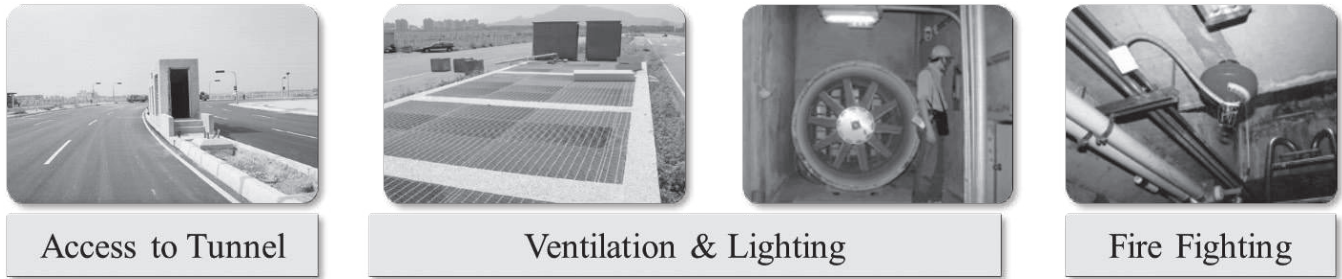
Access to Tunnel, Ventilation & Lightning and Fire Fighting
